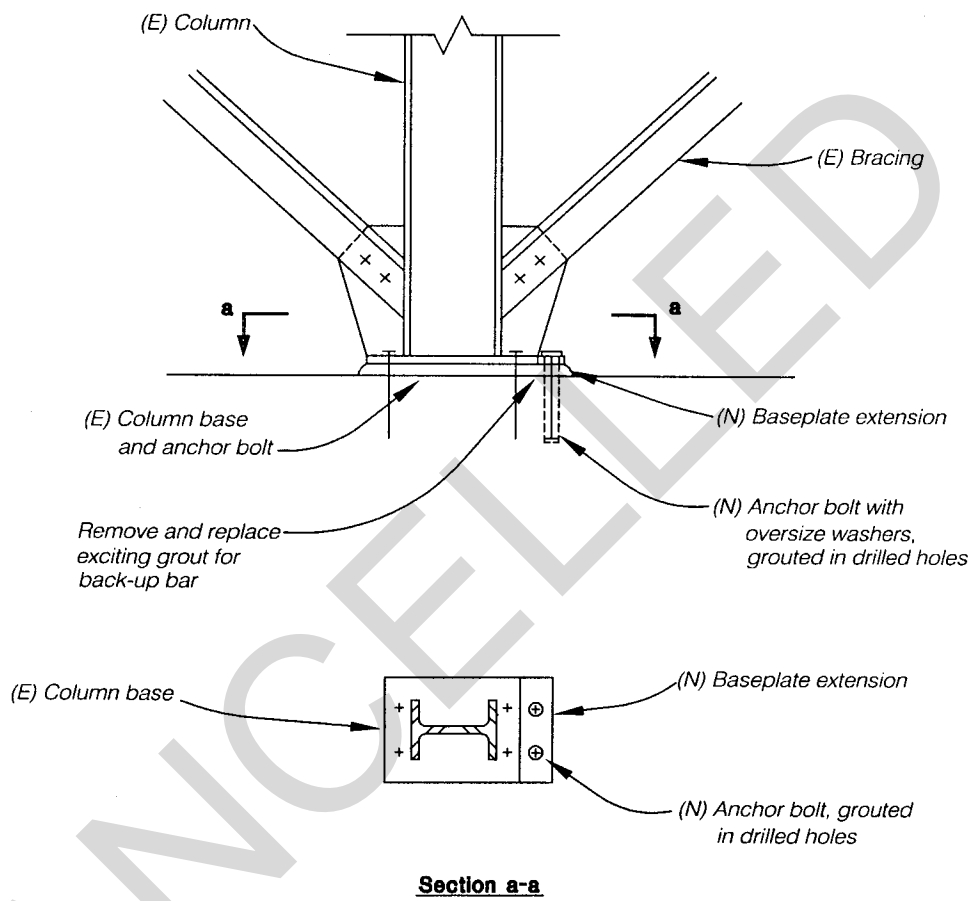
Strengthening of a Column Base Plate in a Braced Frame
